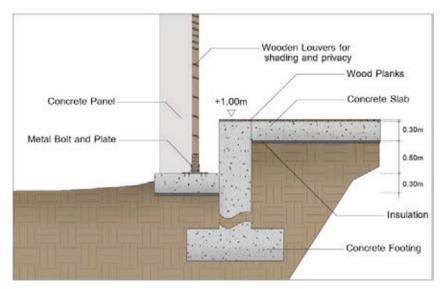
Sectional detail of concrete slab to grade, at terrace
